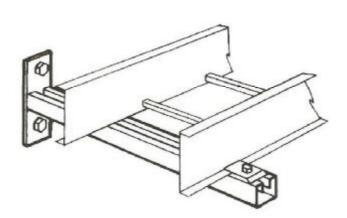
A SINGLE STRUT CANTILEVER BRACKET
